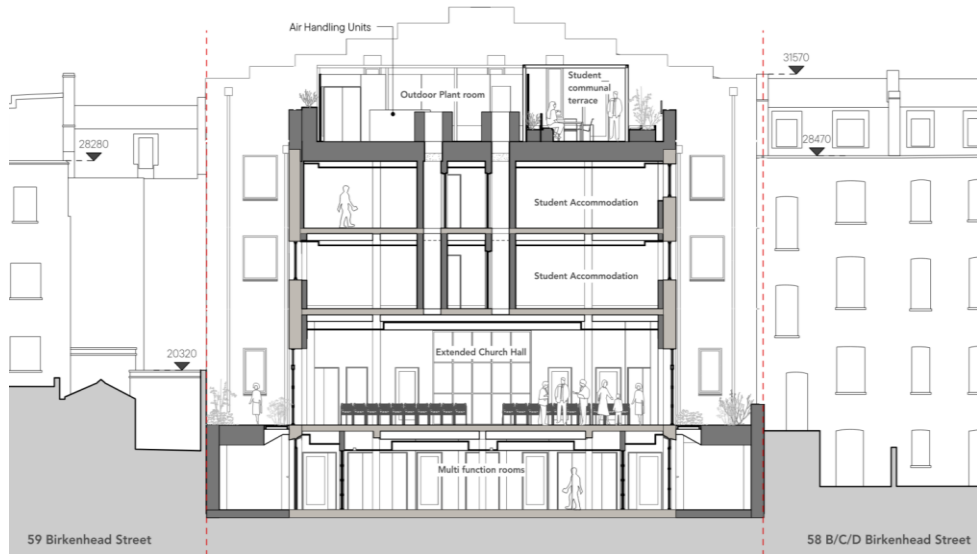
Proposed section showing the relationship between the proposed lightwell gardens and roof terrace and the neighbouring properties
